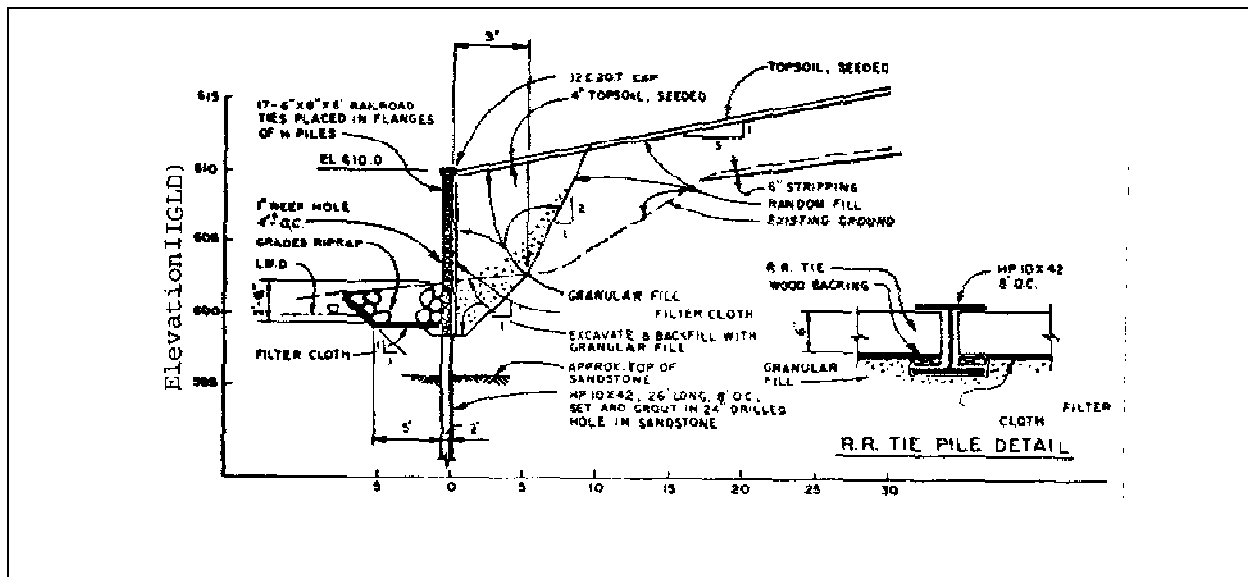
Railroad ties and steel H-pile bulkhead cross section
